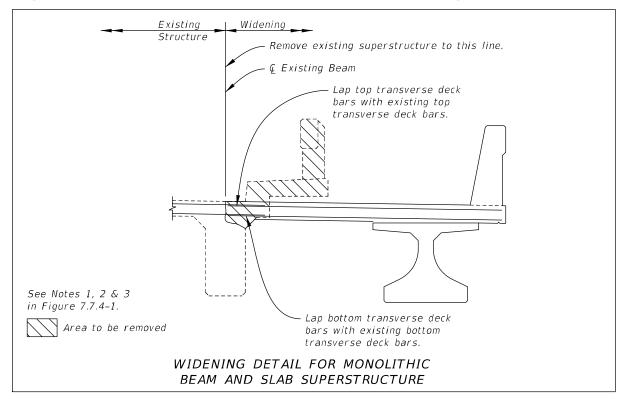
AASHTO Beam Superstructure Widening
